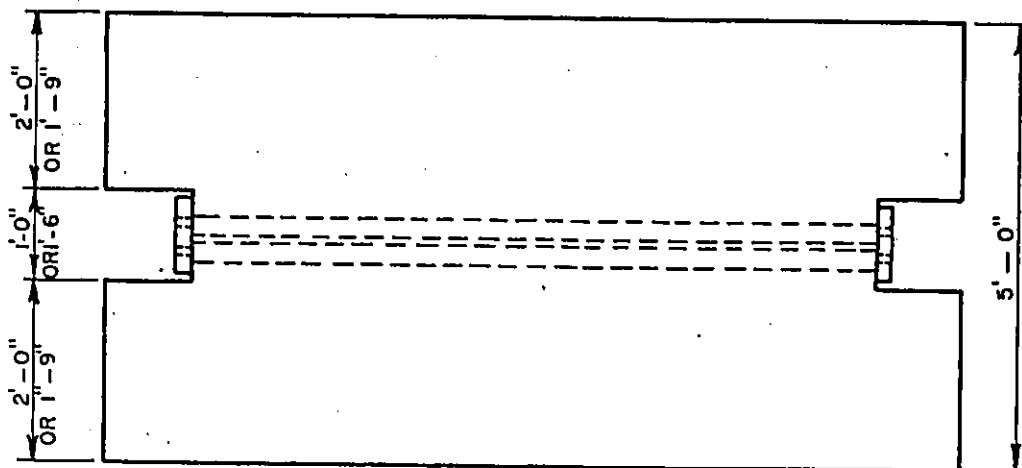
shows a typical test beam and the details of all the test beams are given in Table 5.1.
